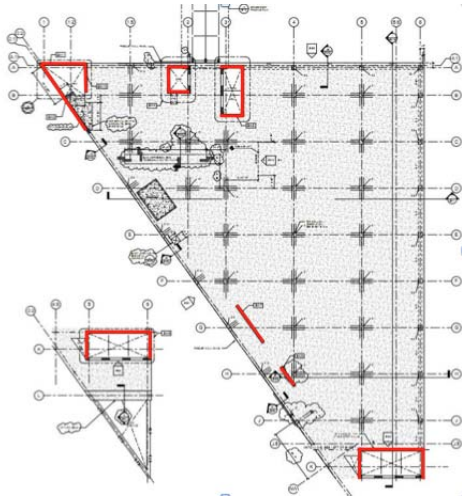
Typical Shear Wall Locations in Below Grade Levels
